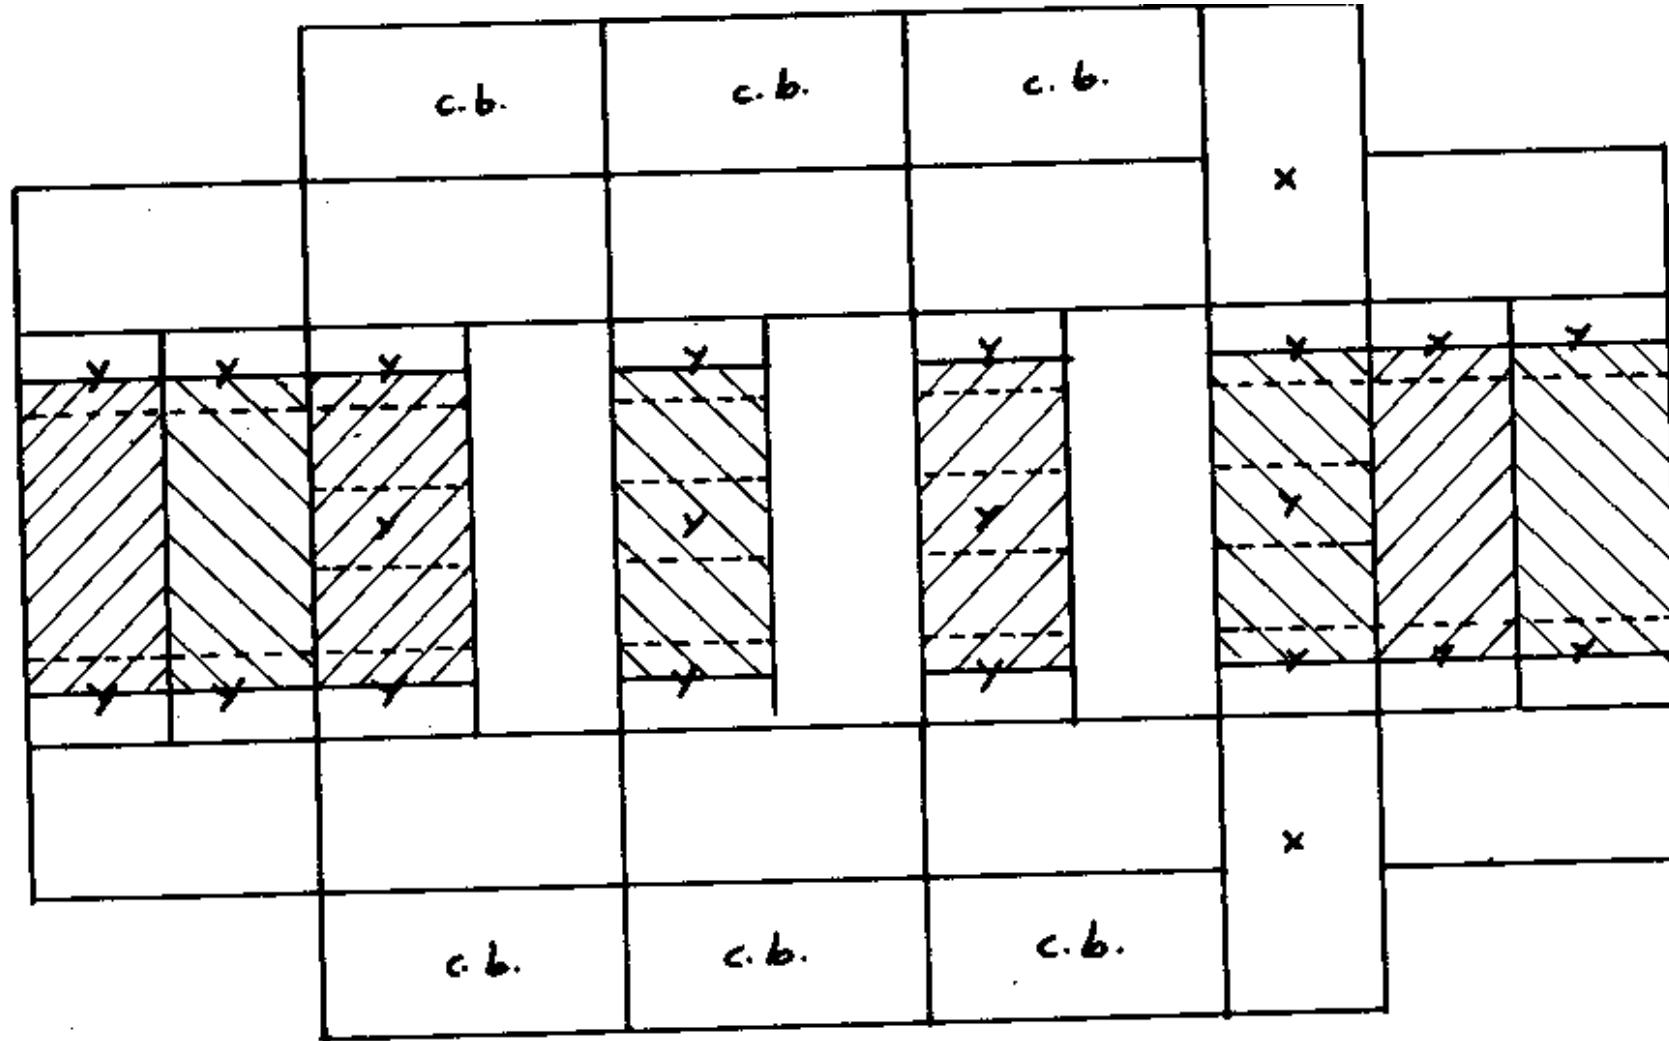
RECTANGULAR KILN: CROSS-SECTION EE' TOP VIEW (SEE FIGURE 3)
